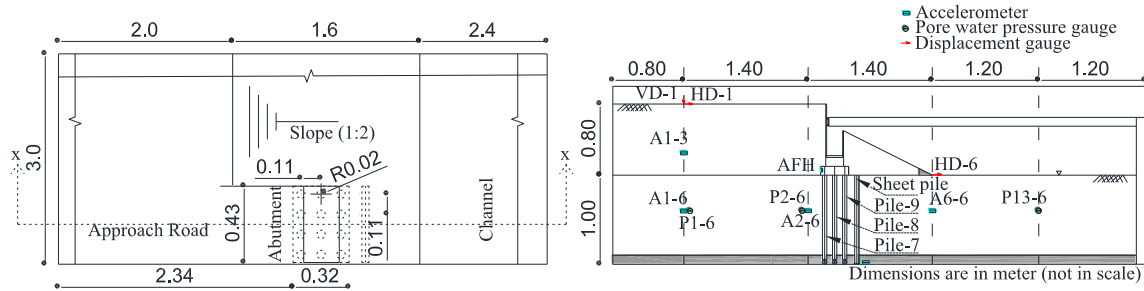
a) Plan view and b) x-x section of Experiment-4.
